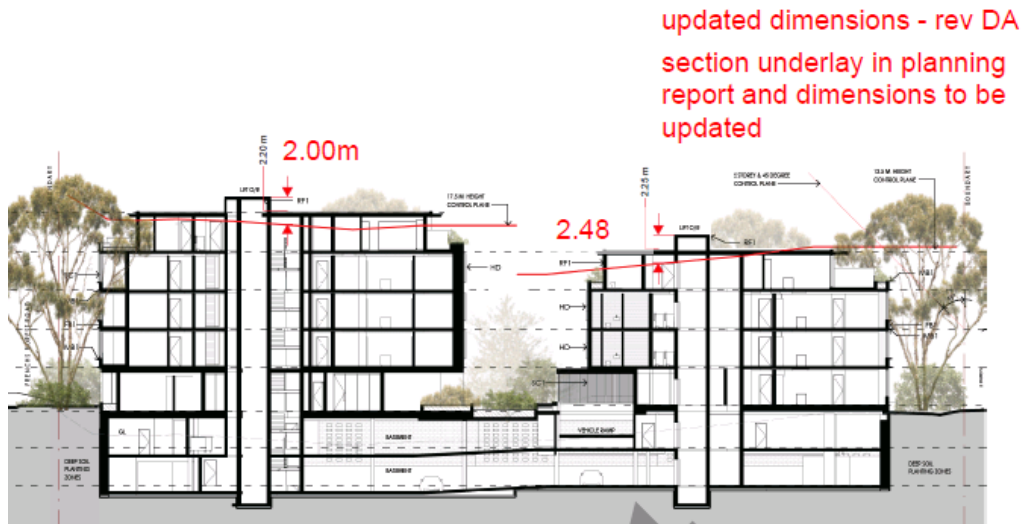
Section illustrating height non-compliances of both buildings (north-south section) - amended.
